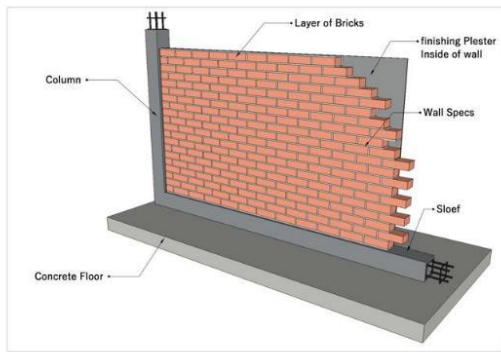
Traditional plastered brick wall as a means of passive fire protection
